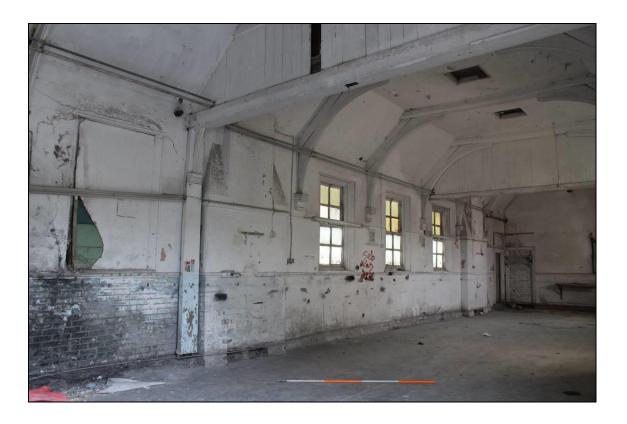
Room 3a, boarded up window northern wall : view north, scale: 1m
